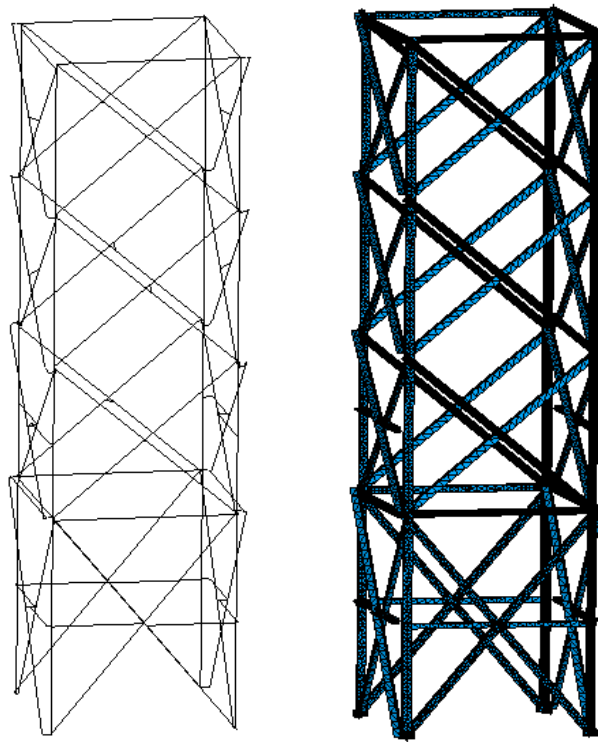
Modelling of a tower section by 1D and 2D elements
